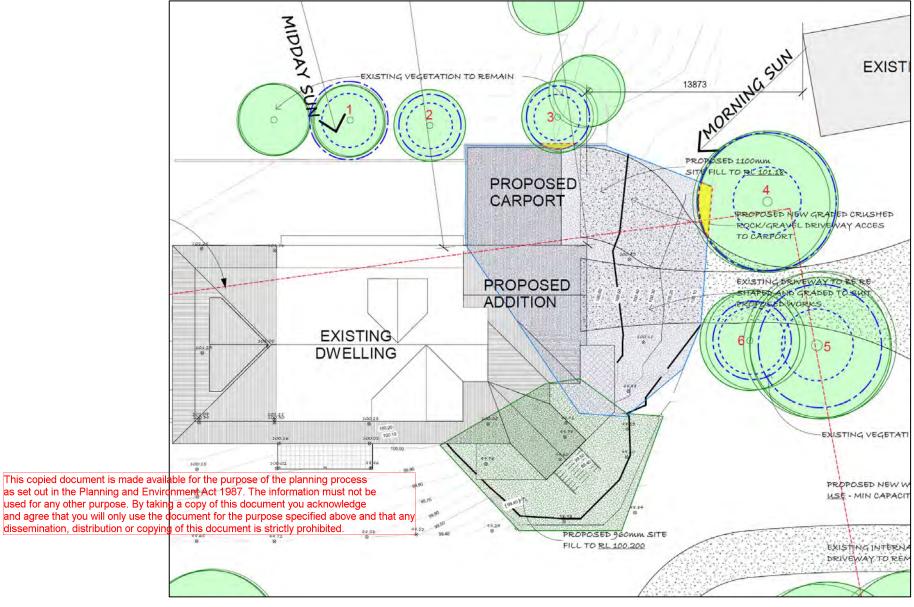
Development Design Proposal 1265 Pakenham Rd, Mt Burnett. Encroachments highlighted on the Site Plan.
